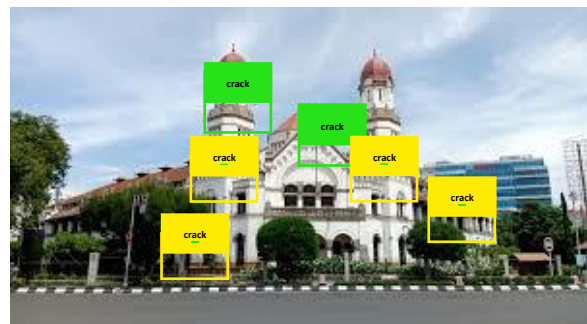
shows Lawang Sewu with two towers and large arched openings.
